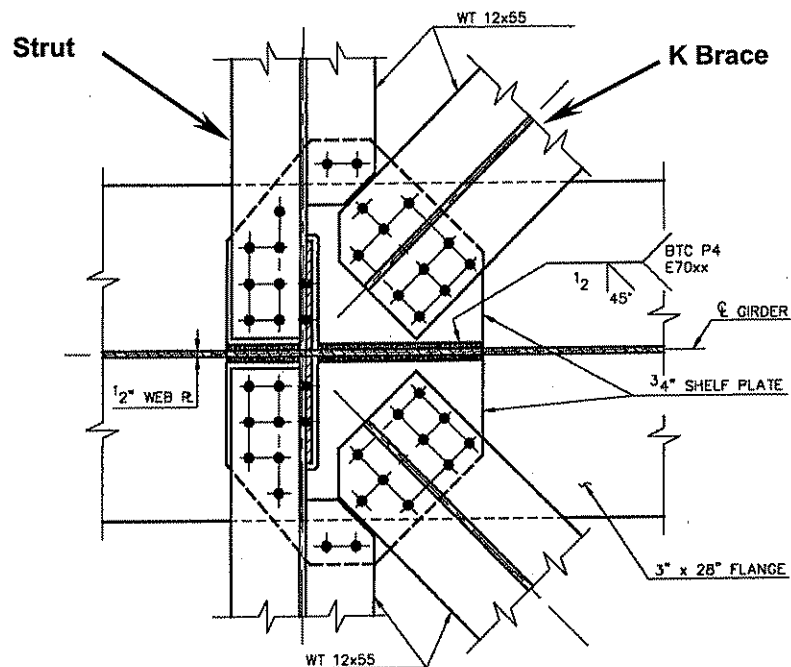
Gusset plate detail for interior girder used on failed span of Hoan Bridge in Milwaukee Wisconsin
